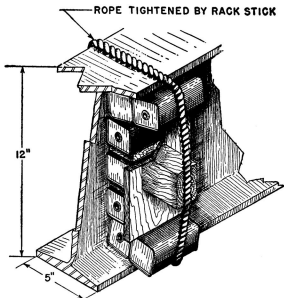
How to blow 12-inch I-beam. Note location of TNT blocks.
